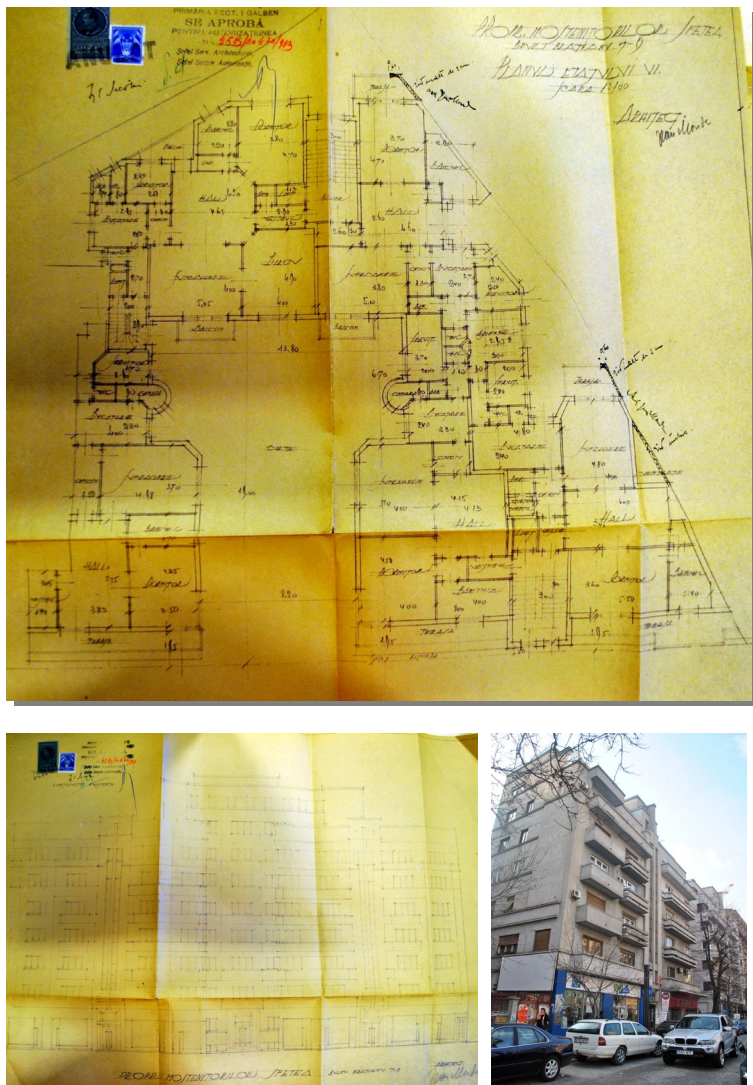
Bloc of flats, Nicolae Bălcescu 7-9, Architect Jean Monda (1934-35). Facade drawing and plan from the Town Hall of Bucharest city archives (PMB fond tehnic). Photo: Maria Boștenaru-Dan, 2015. Listed Cod LMI: B-II-m-B-18104
